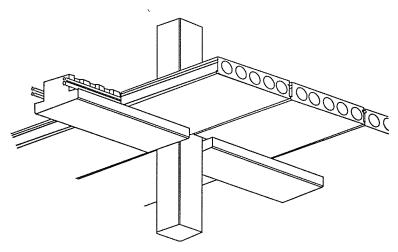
The EKON precast concrete structural system (Bennenk and Boom 1992).
